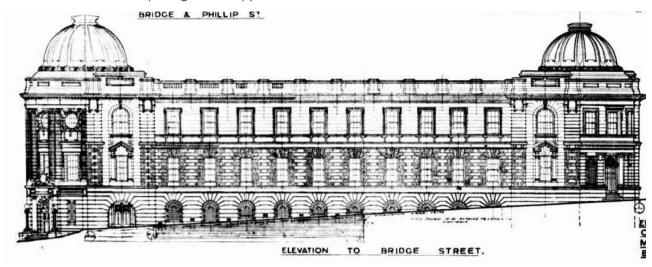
Additions to Treasury by George McRae in 1916 (Proposed elevation to Bridge Street – domed ends were never constructed)
